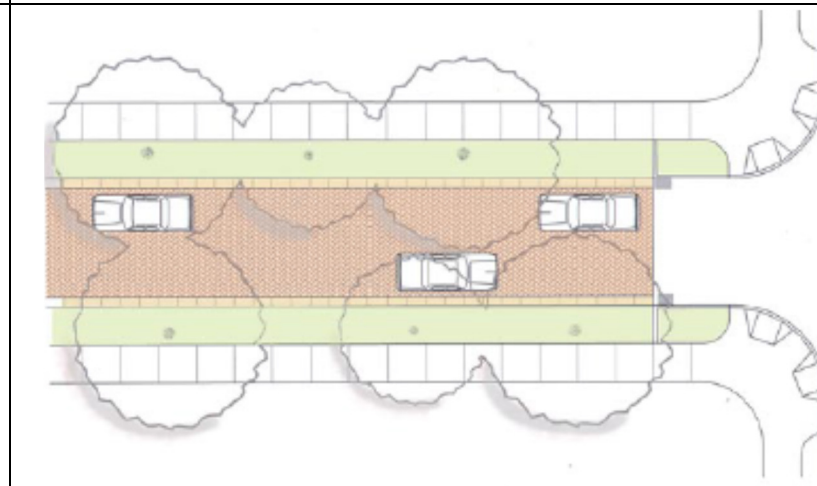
Flat Street Profile. Flat streets are designed to drain through pervious paving. While these facilities do not have a marked slope, they may be graded slightly so that they drain to the sides or center of the street when there is too much water.
